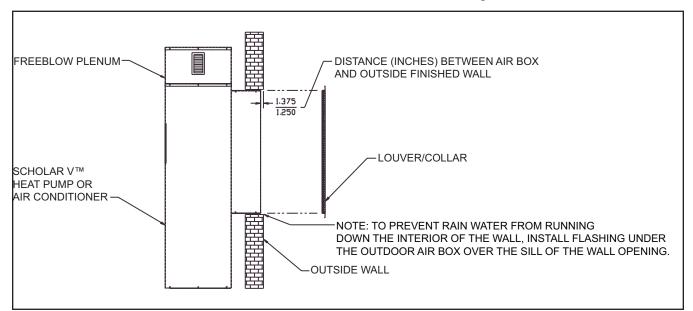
Dimension between Scholar V Air Box and Finished Outside Wall for Outdoor Louver/Collar Assembly Installation.
